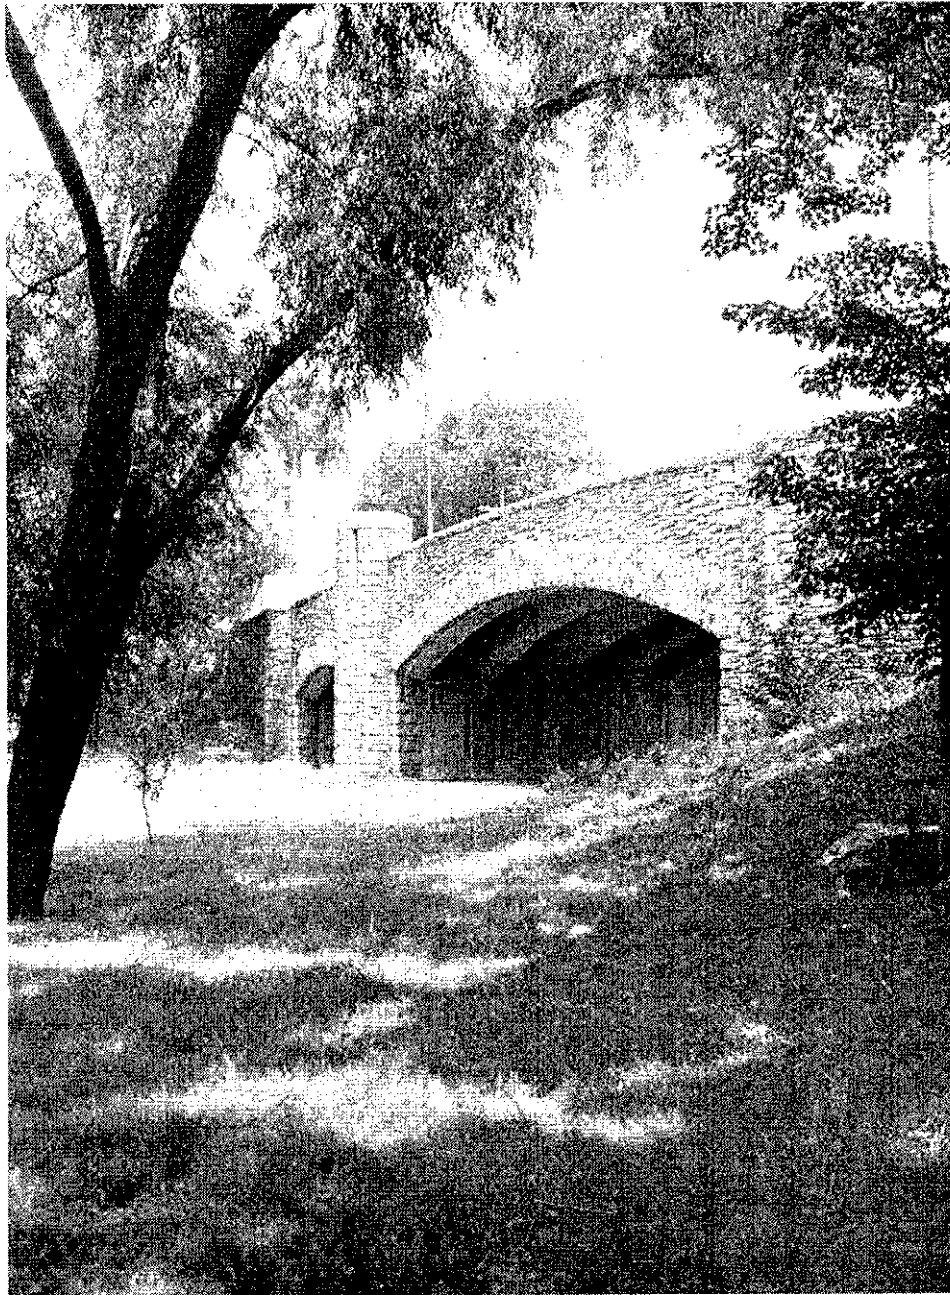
Classic stone-faced, rigid-frame concrete-arch parkway underpass and landscape setting, Mount Vernon, N.Y. (Westchester County Park Commission)
